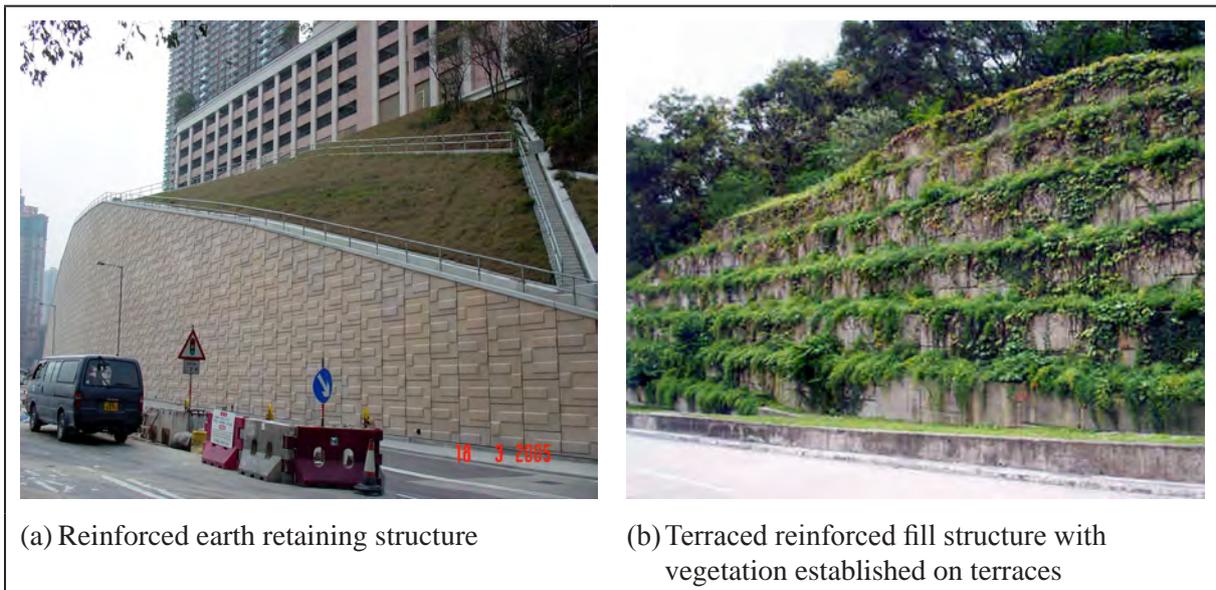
Aesthetic Treatment for Reinforced Earth Retaining Structures
